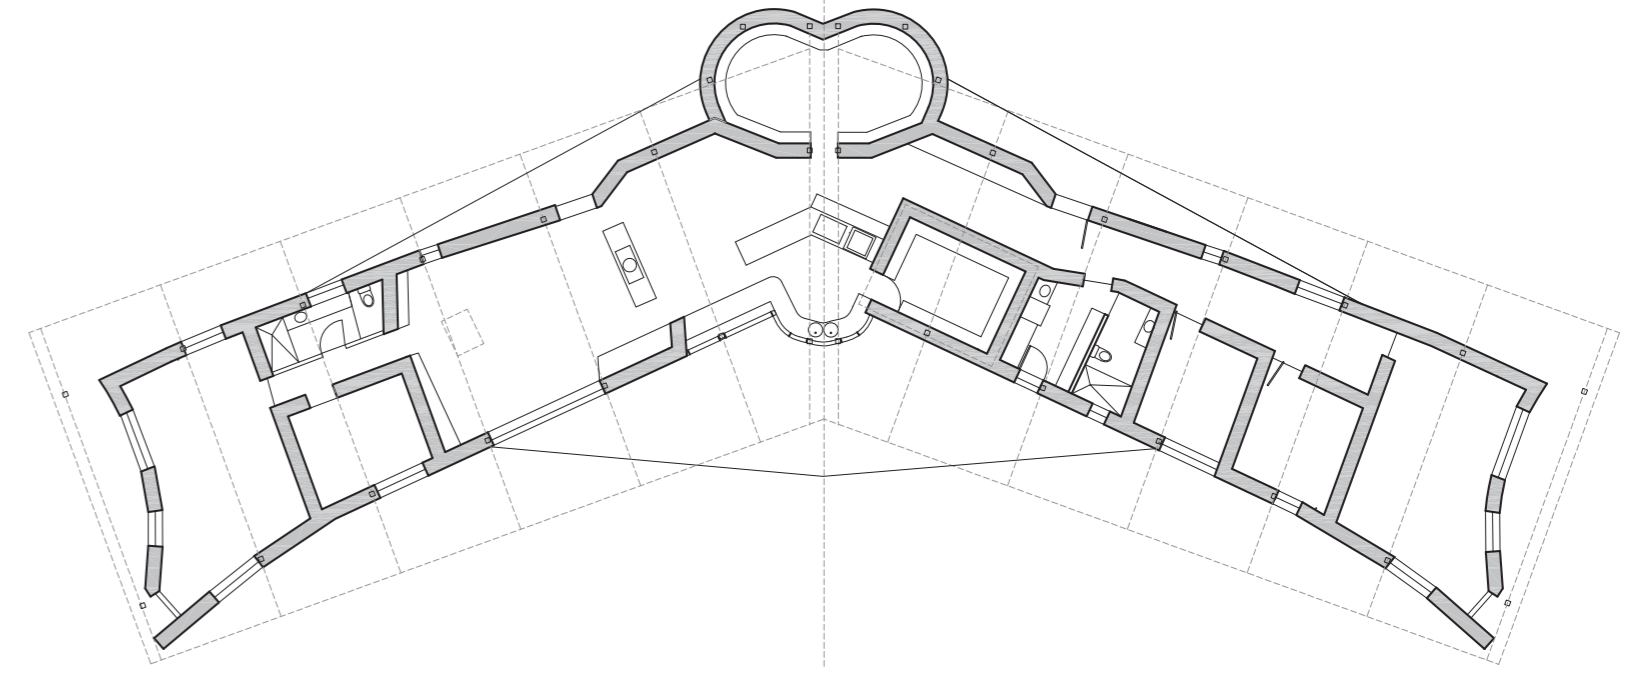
Strawbale House, Merrijig Victoria. Floor Plan bifurcated for two couples sharing the space.
